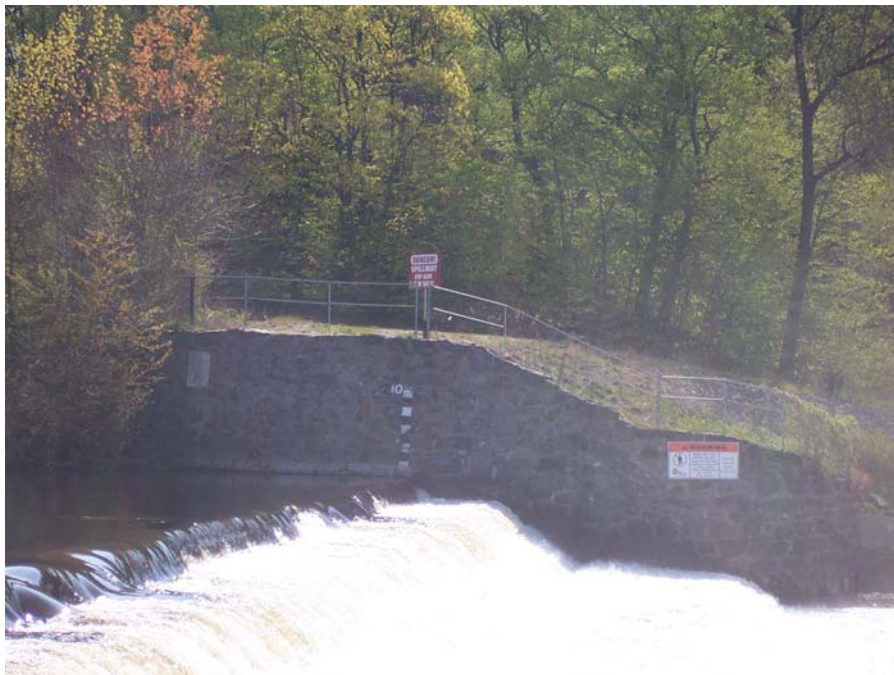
View of warning signs and fencing on left abutment. The lower sign is directed to fishermen/canoeists accessing the downstream areas of the river.
